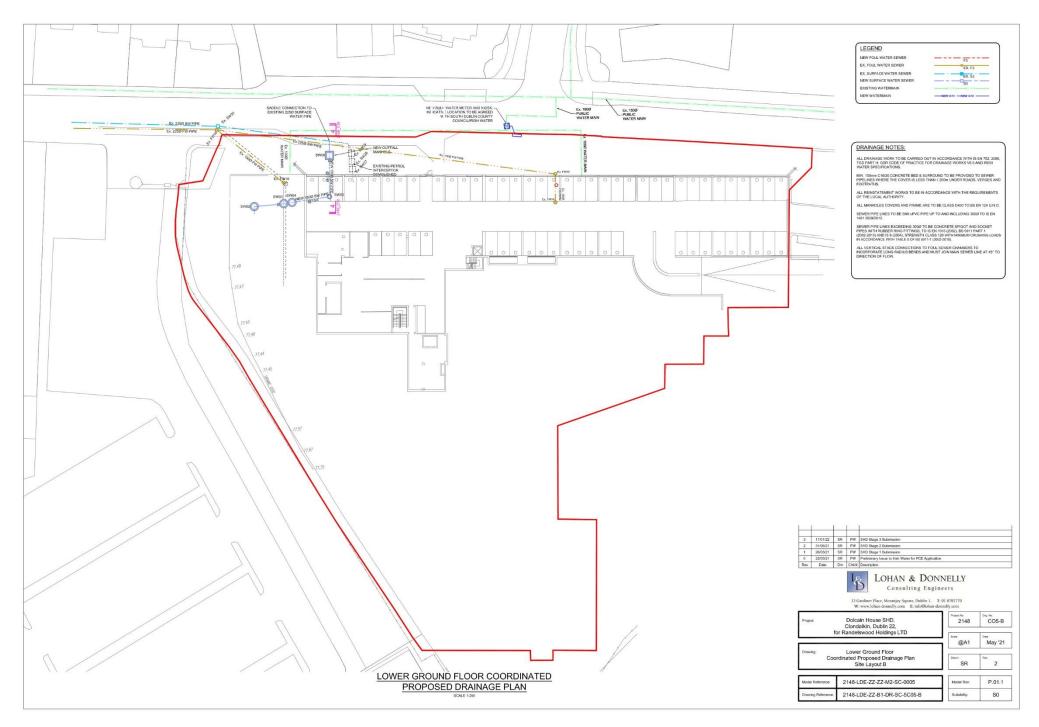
Proposed drainage plan - lower ground floor (co-ordinated) – Option B
